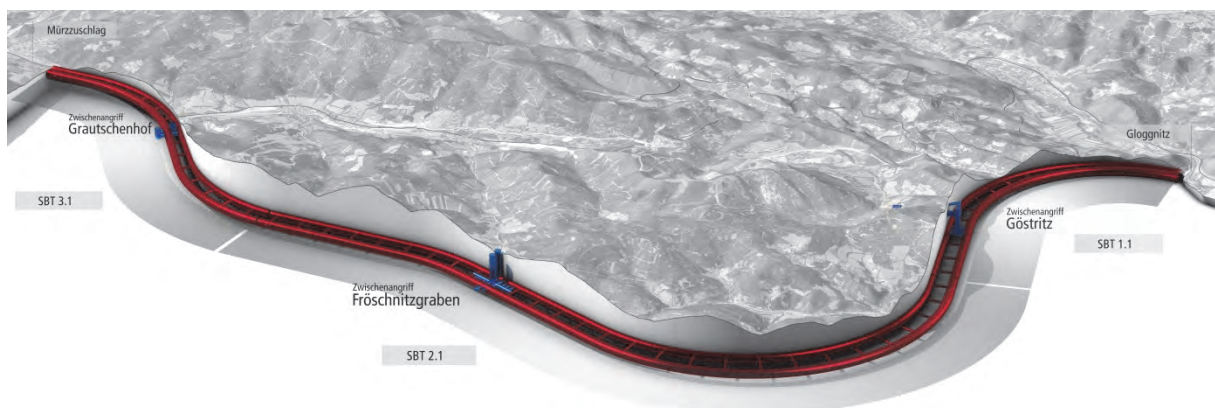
Semmering Base Tunnel: Overview and construction sections (ÖBB, 3DSchmiede)
